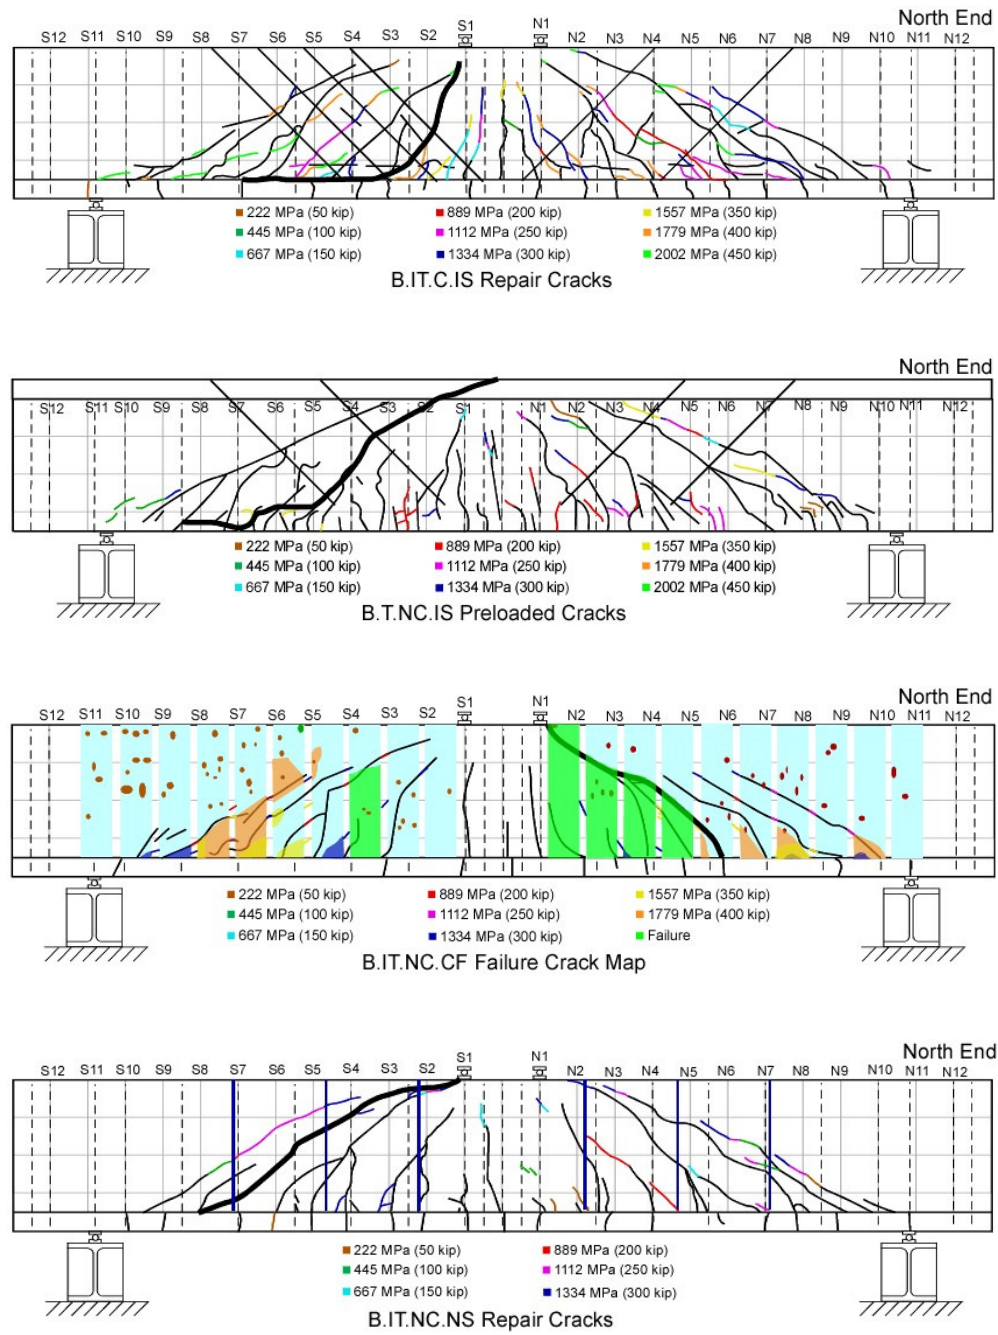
Beam specimen crack maps: individual load steps indicated continued
